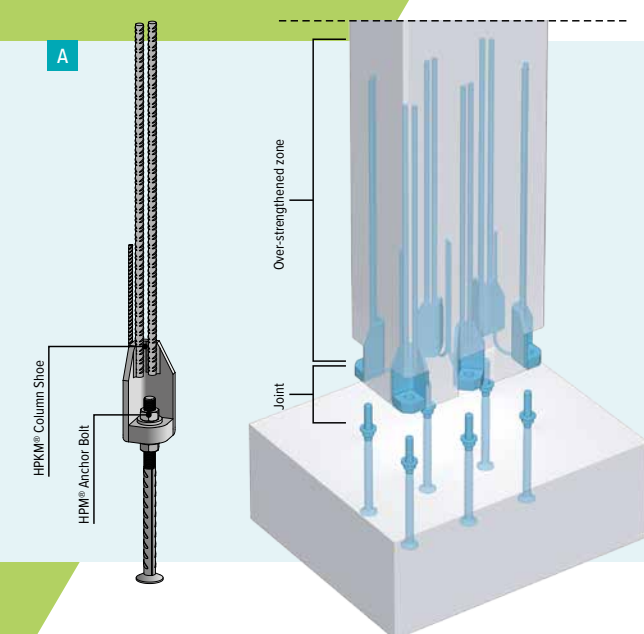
(A) PEIKKO'S BOLTED COLUMN-TO-FOUNDATION CONNECTION (ADAPTED FROM [16], [17])
